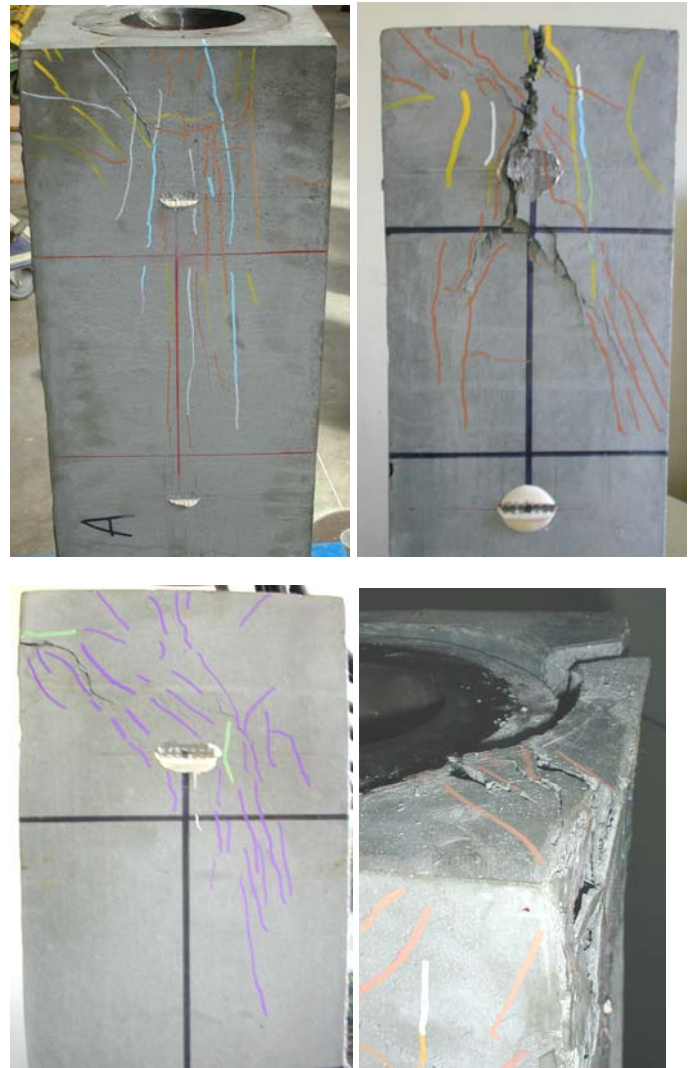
First vertical cracks (splitting), multiple parallel branching, and final diagonal cracks due to unstable failure mechanism. Top, left) Block 8. Top, right) Block 3. Bottom, left) Block 4. Bottom, right) Block 7.
